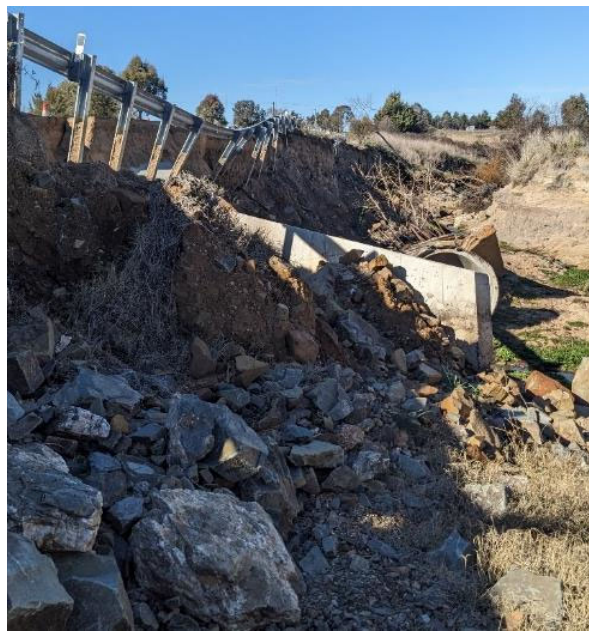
Collapsed culvert headwall and rubble within Kellosiel Creek
